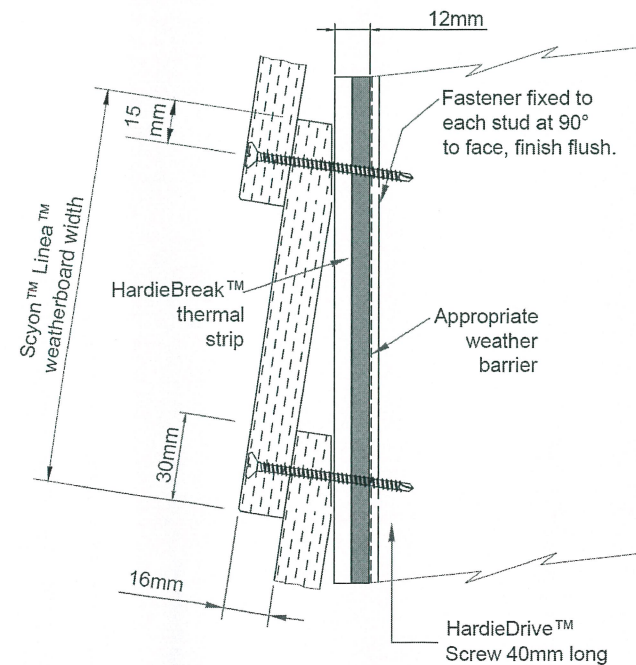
Face Fixing Detail (use when bracing capacity is required)
